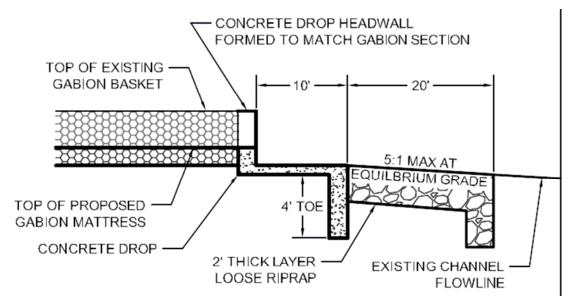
Concept Profile of Drop Structure near Section 25+50.
